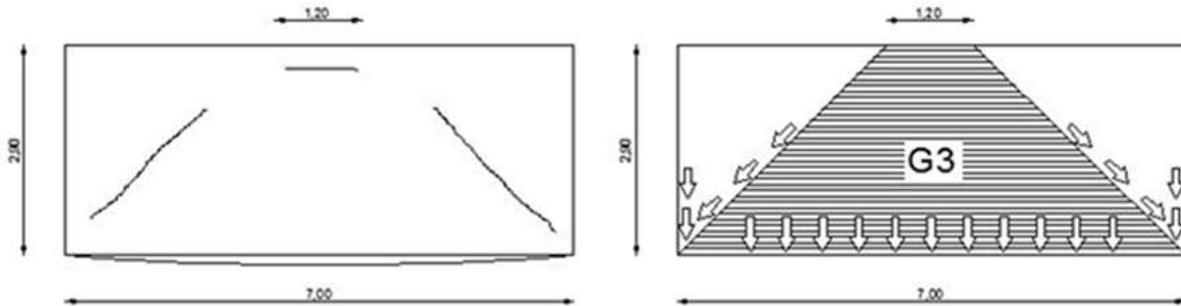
Cracks when deforming support beam of 7m. And creep loads.Loads calculation.
